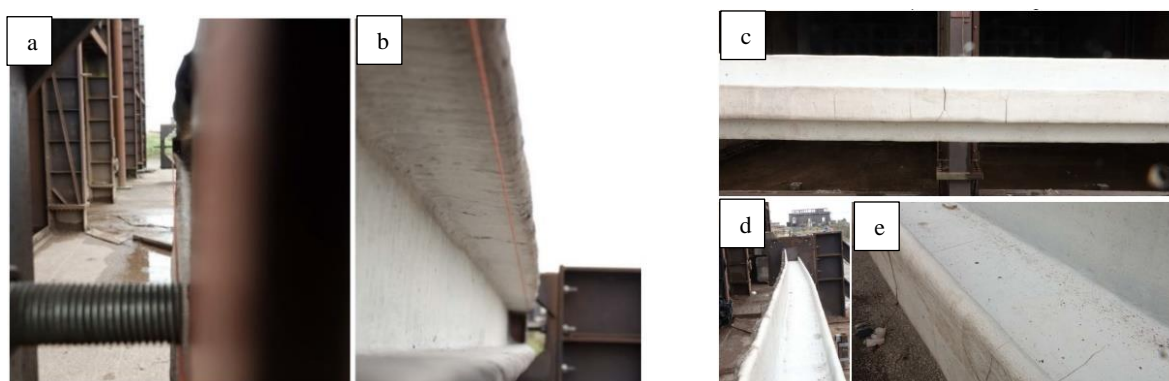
Plate girders post-test. Bending on exposed face (a) and bending on tensile face of PG1 (b), Bending of PG2 (d) and crack formation on unexposed flange (c and e)
